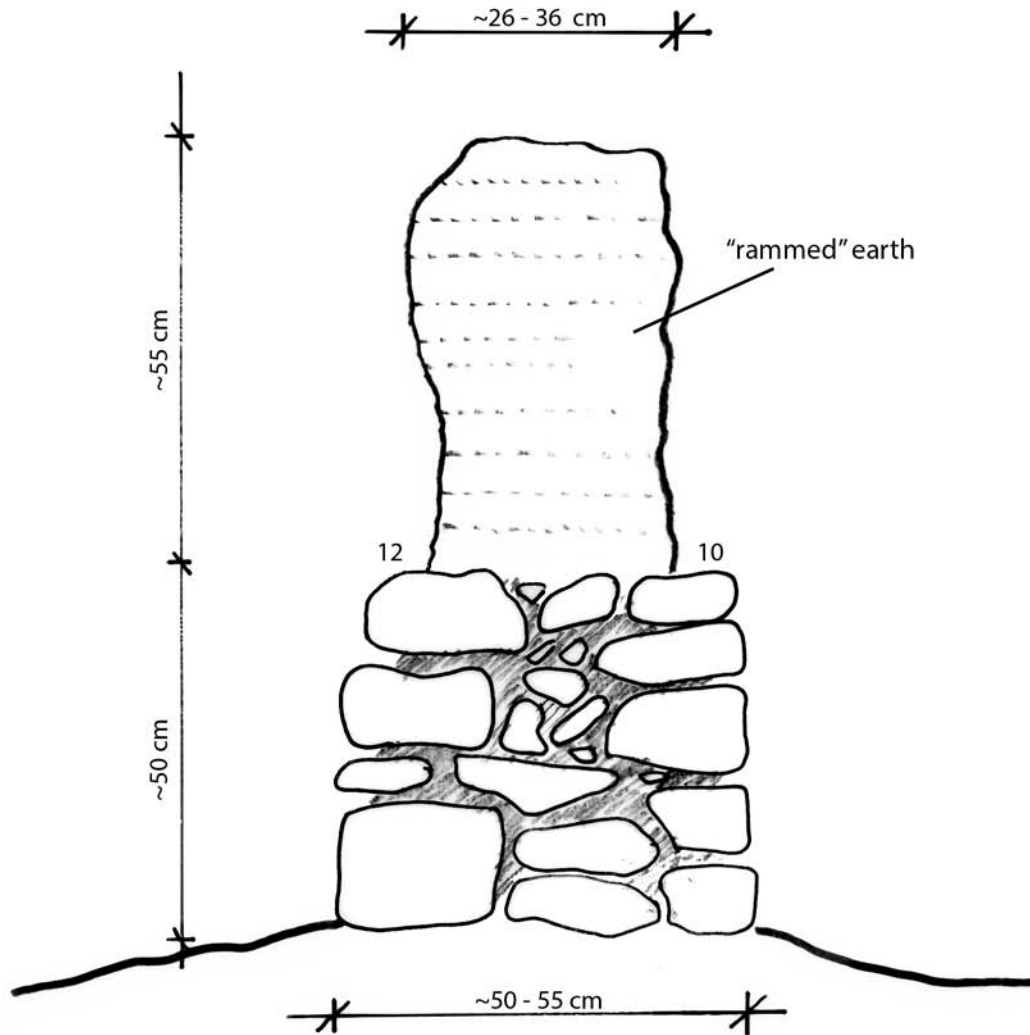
'Ain Mohammad: section through last remains of earthen wall structure.
